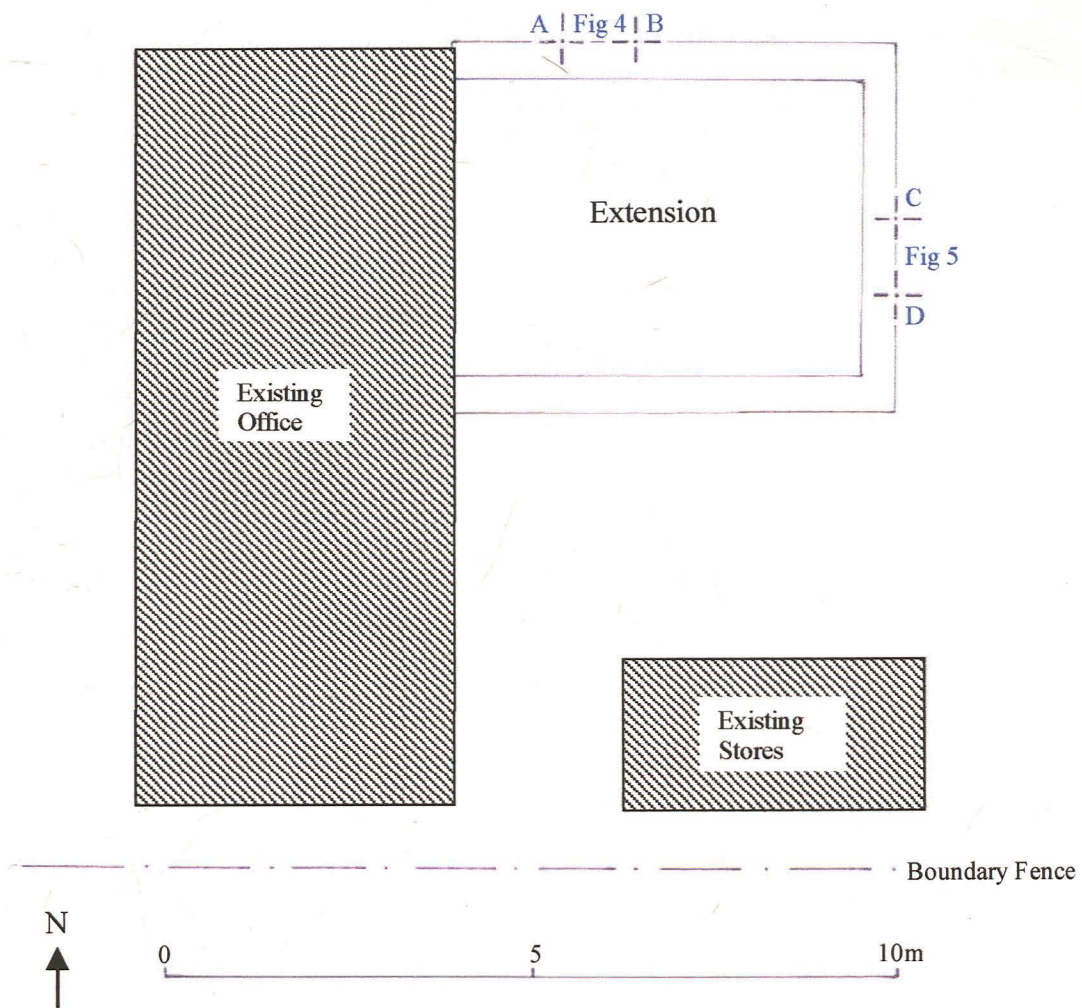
Plan of foundation trenches for extension showing locations of recorded sections (Figs. 4 and 5). Scale 1:100
